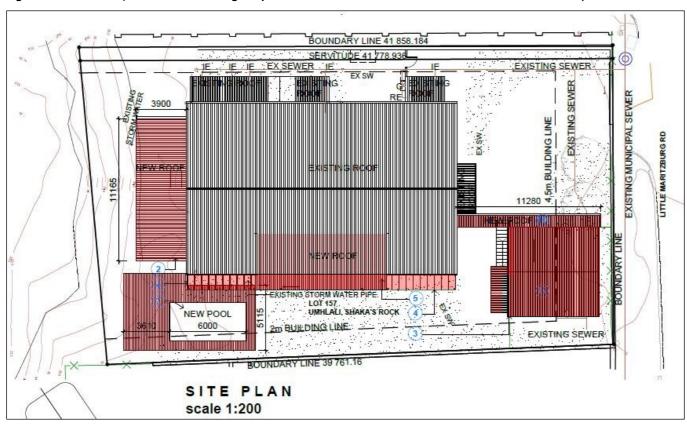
Site Development Plan Showing Proposed New Infrastructure for House Gotz Shaded in Red (Source: ZAARC Architects, 2021).
